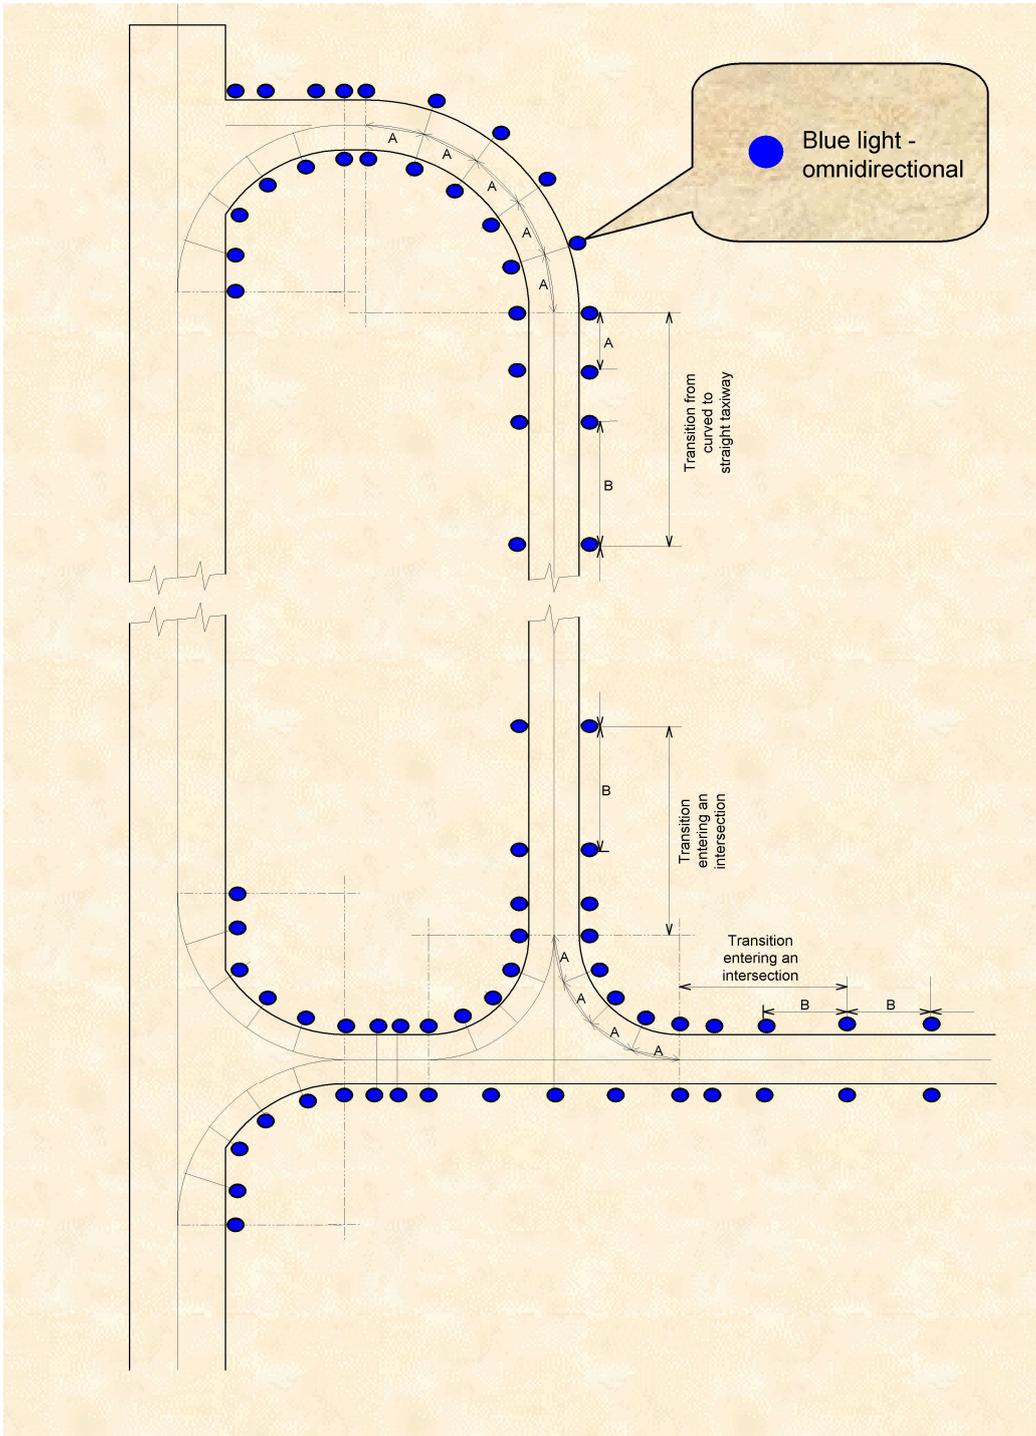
Typical Taxiway Edge Lights Layout
